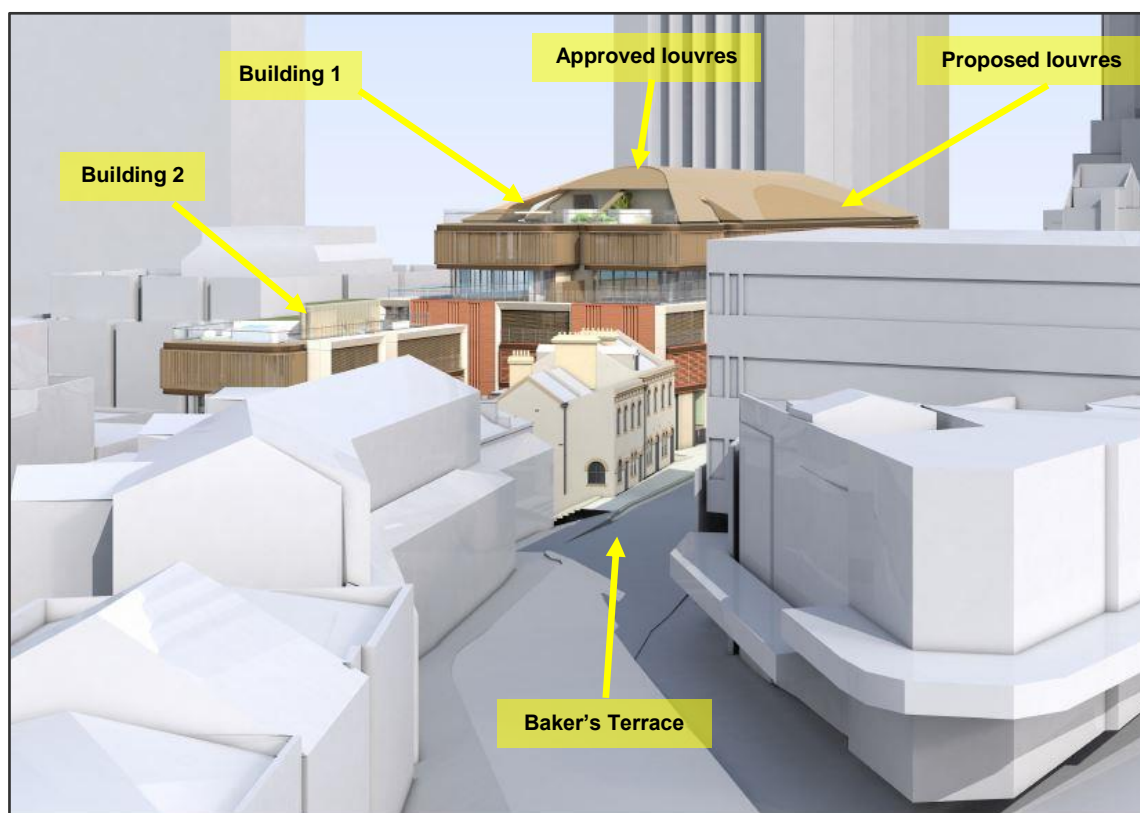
| Proposed development photomontage showing roof looking south-east (Source: SSD 7037)
